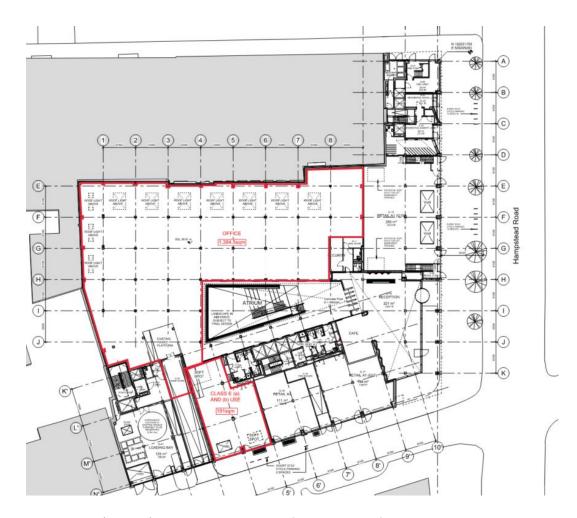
(above): Existing ground floor plan of the whole development showing the proposed floor area that forms part of the proposal.
